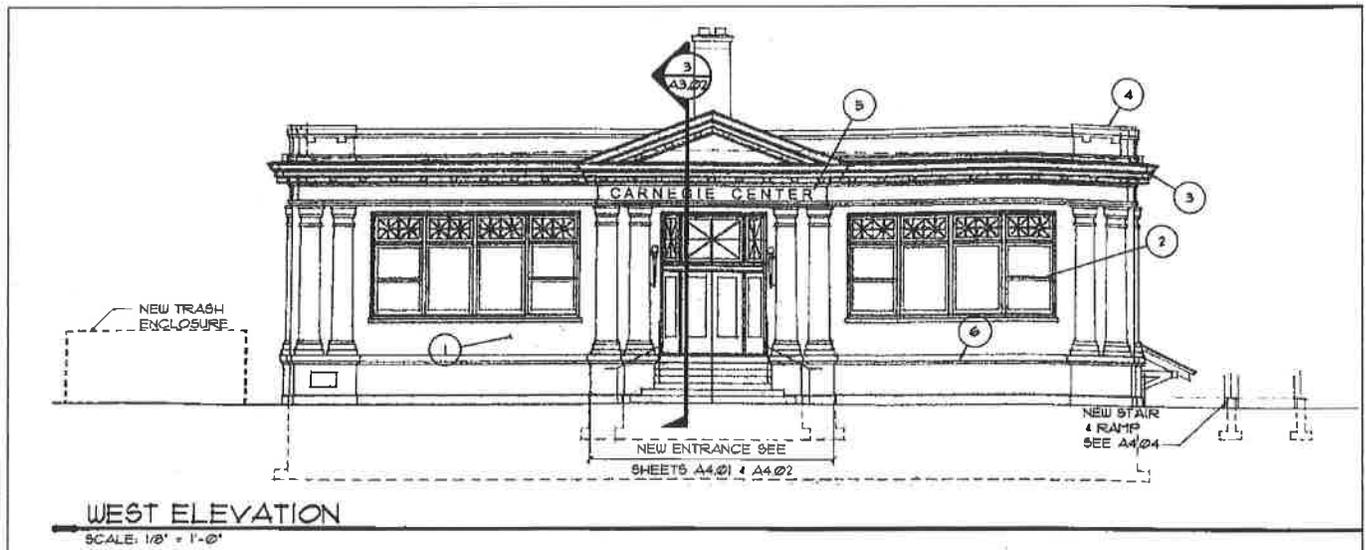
Renovation Plans, Primary Façade, Slusarenko Architecture, PC, 2001.
